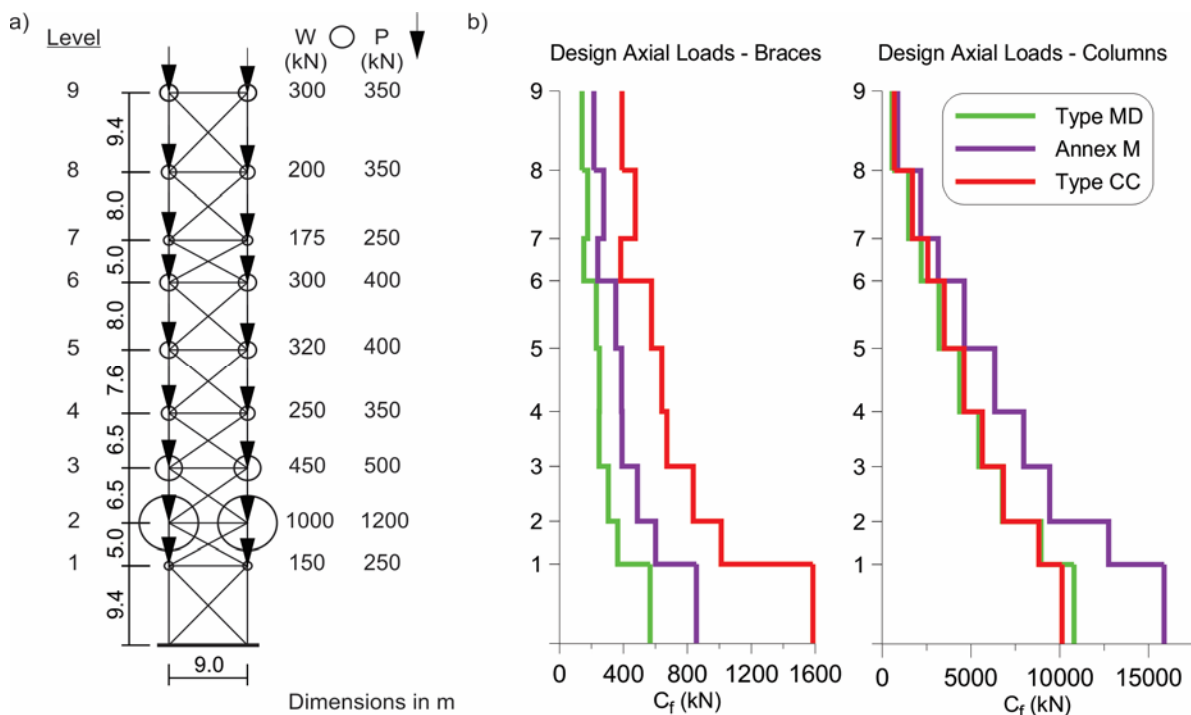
Prototype structure: a) Geometry and properties; b) Design axial loads in braces and columns.
